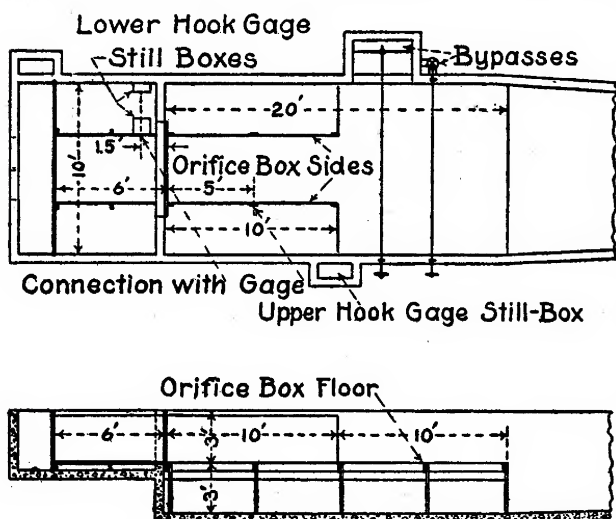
Plan, elevation, and section of orifice box in concrete channel.
